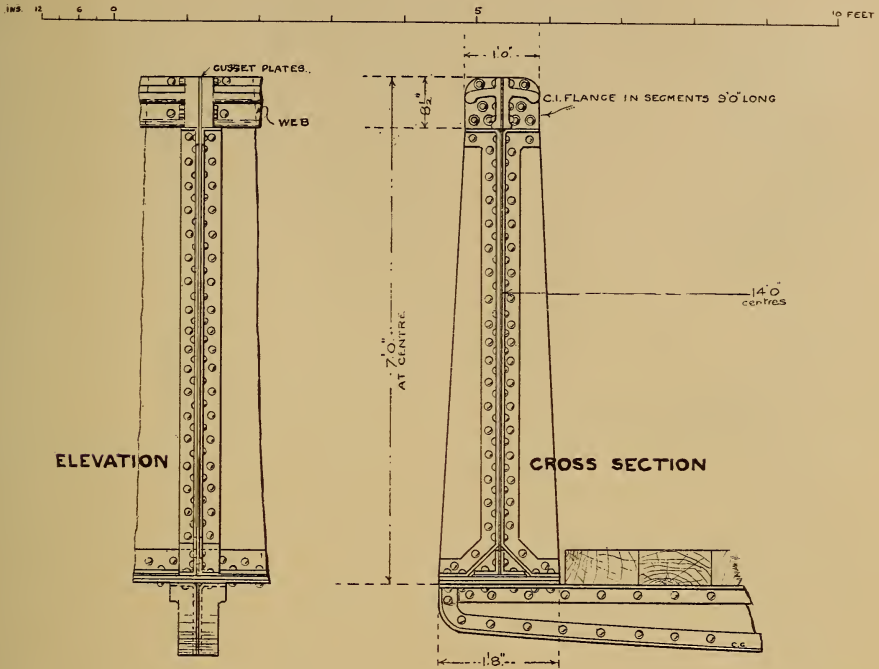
GIRDERS OVER RIVER NIDD AT POTELEY BRIDGE, YORKSHIRE. SPAN 96 FEET. T. E. HARRISON, ENGINEER, 1862
